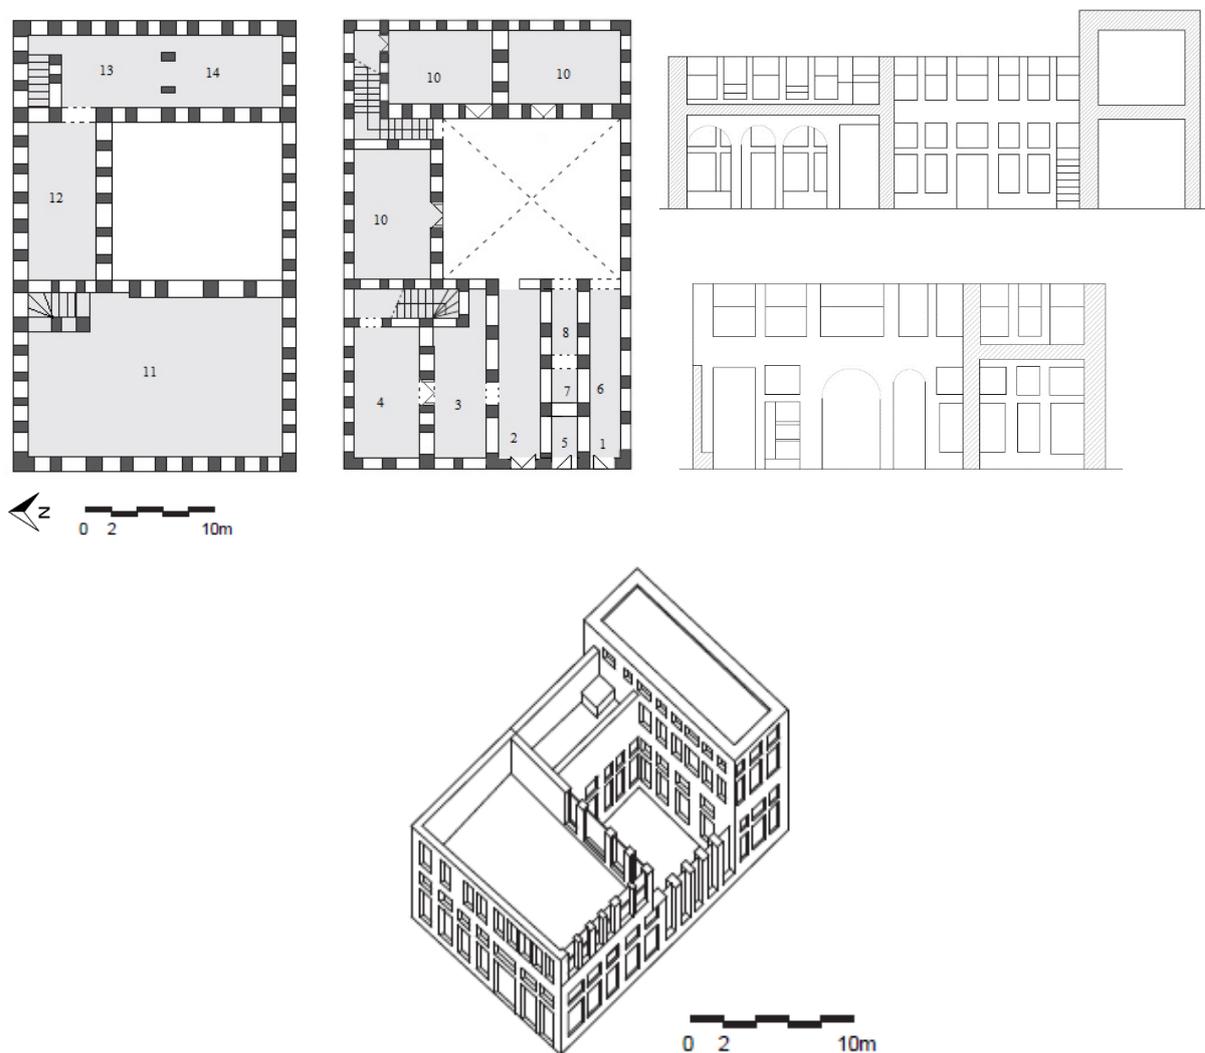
Isometric plans and front elevations of a common house in the Eastern Province. This house was located in Al-khobar city.
